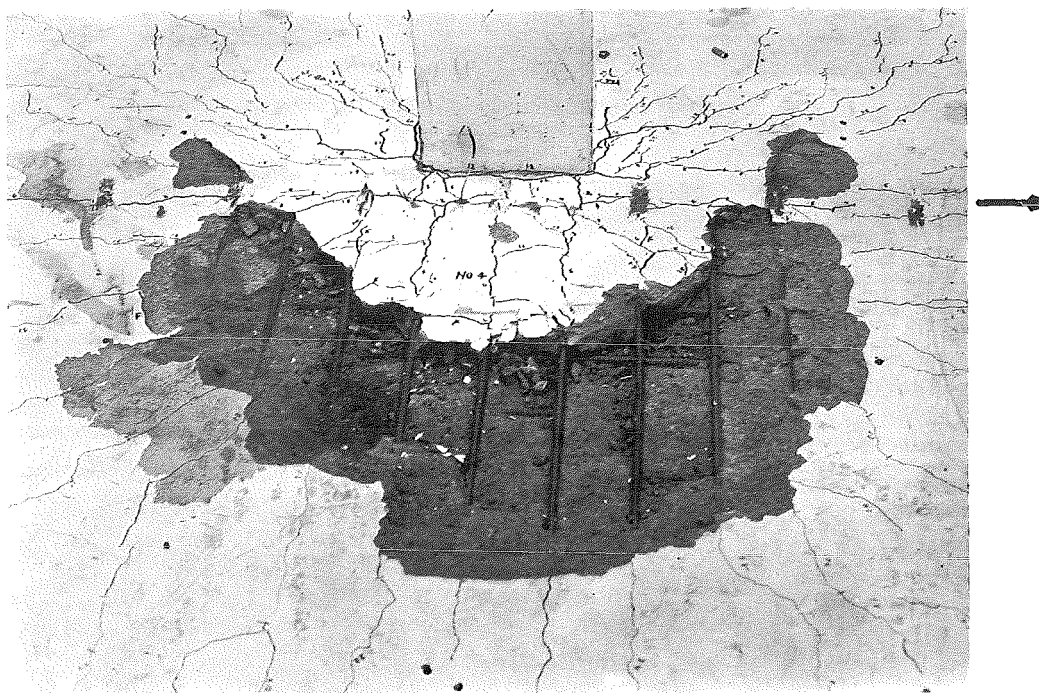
FAILURE SURFACE OF SPECIMEN 4S
